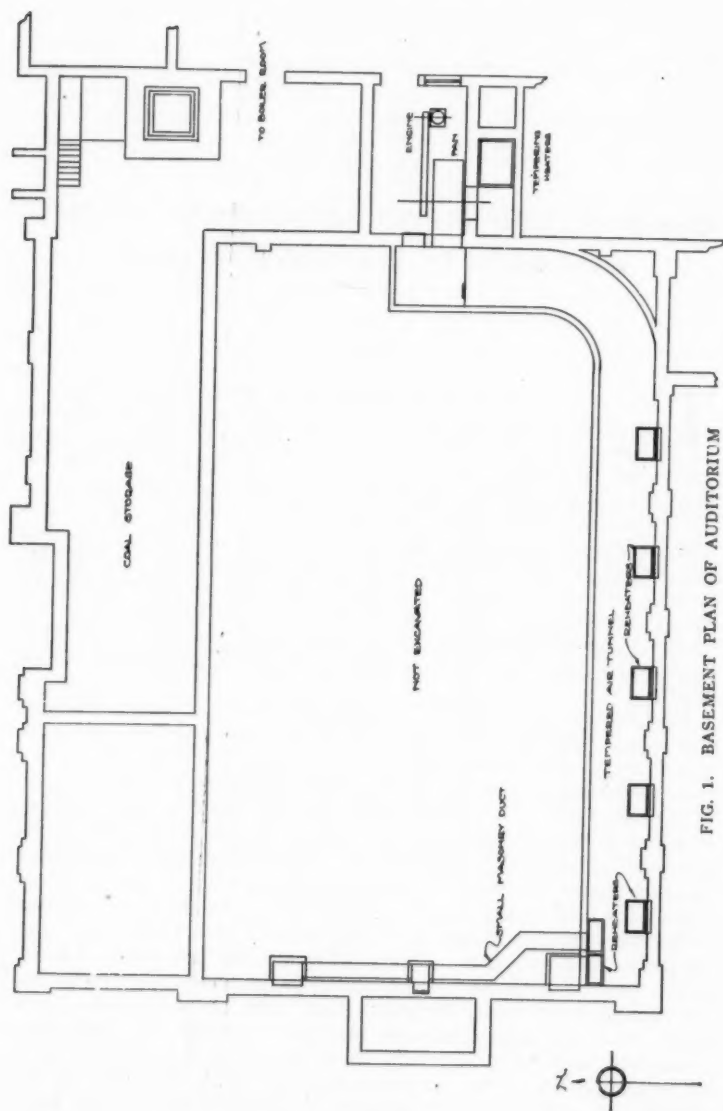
BASEMENT PLAN OF AUDITORIUM
